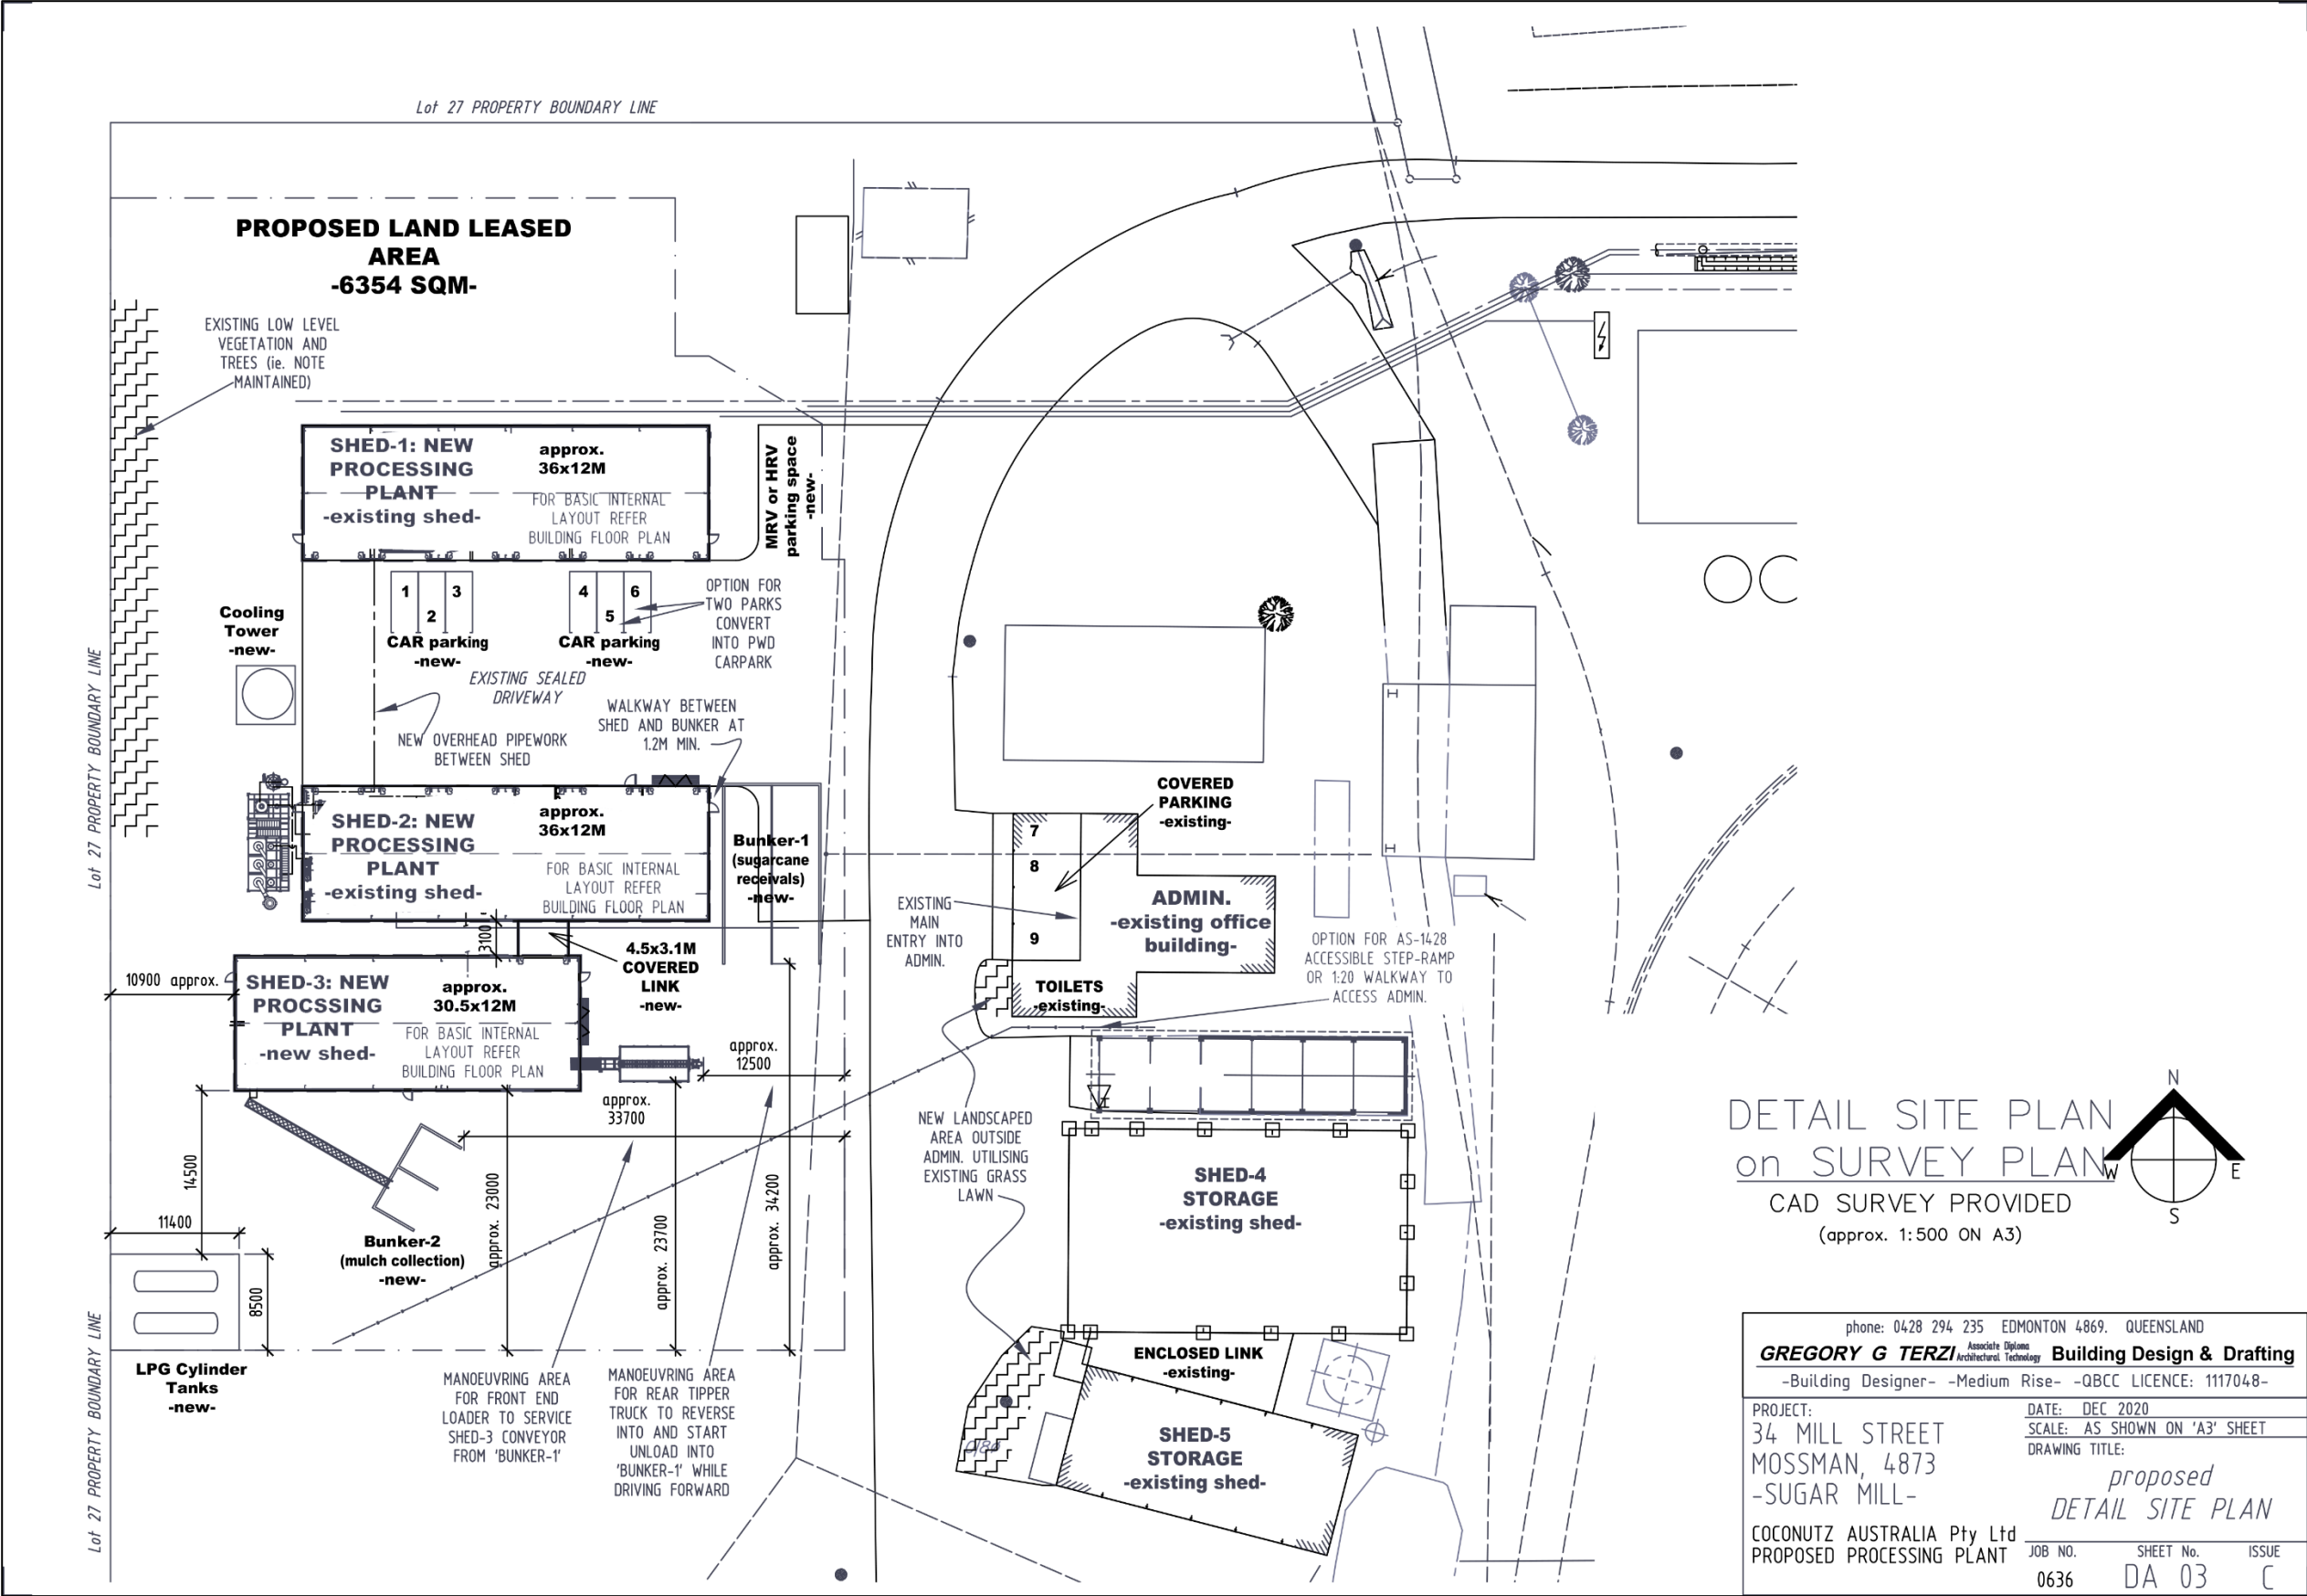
Layout of Processing Buildings (Shed-1, Shed-2 and Shed-3) and Fixed External Plant
